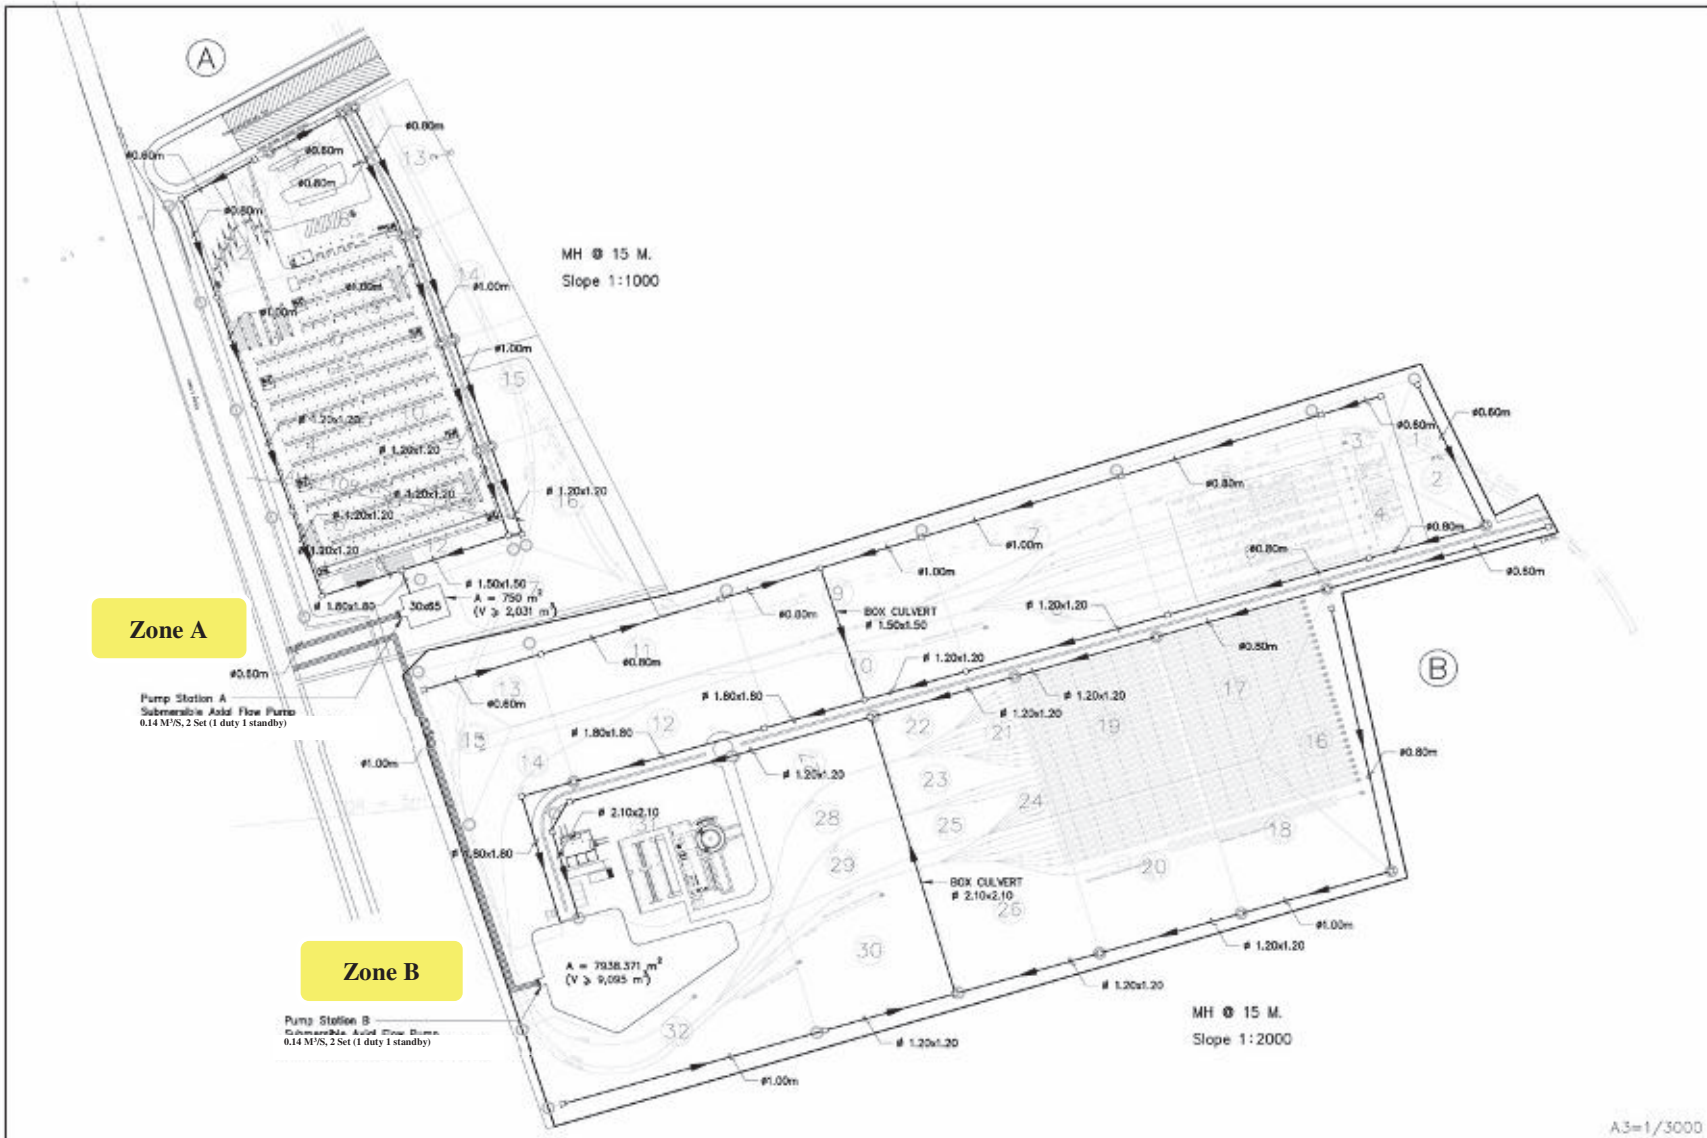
Water Flow Direction into Water Retention Ponds at Depot and Park & Ride Building at Rom Klao Intersection
